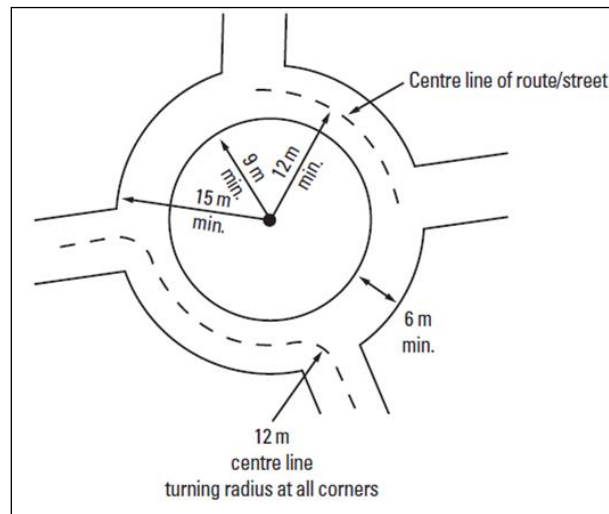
Roundabout Minimum Dimensions - Source: City of Calgary Fire Department Access Standard (2008)
